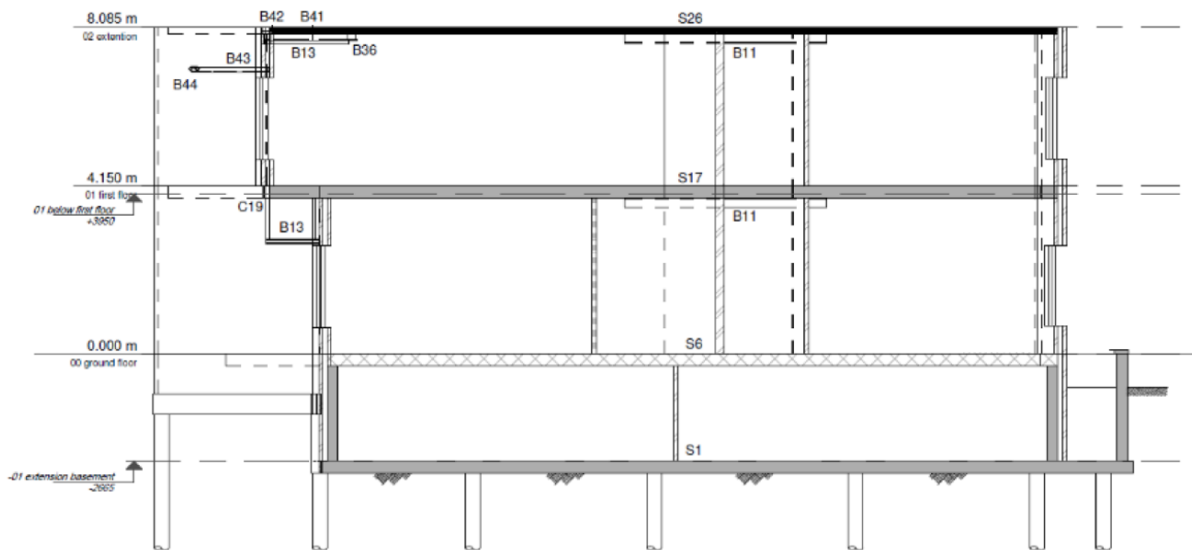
Building with basement case-study: structural drawing (Witteveen+Bos, 2019) of portion selected for this study.
